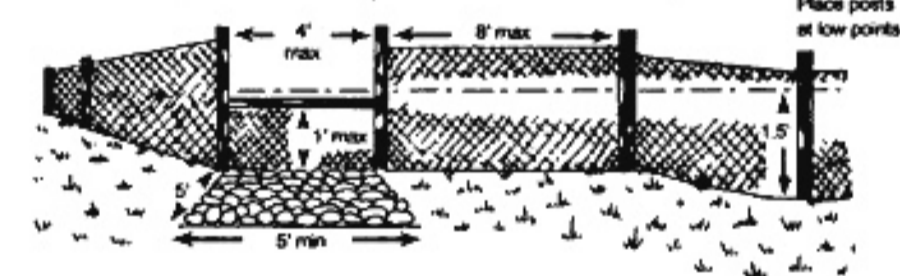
Perspective of reinforced, stabilized outlet for sediment fence.
